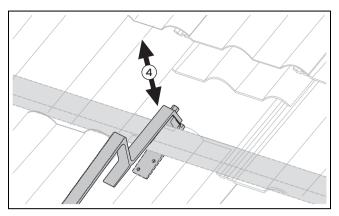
Positioning the type P roof bracket correctly on the roof batten
